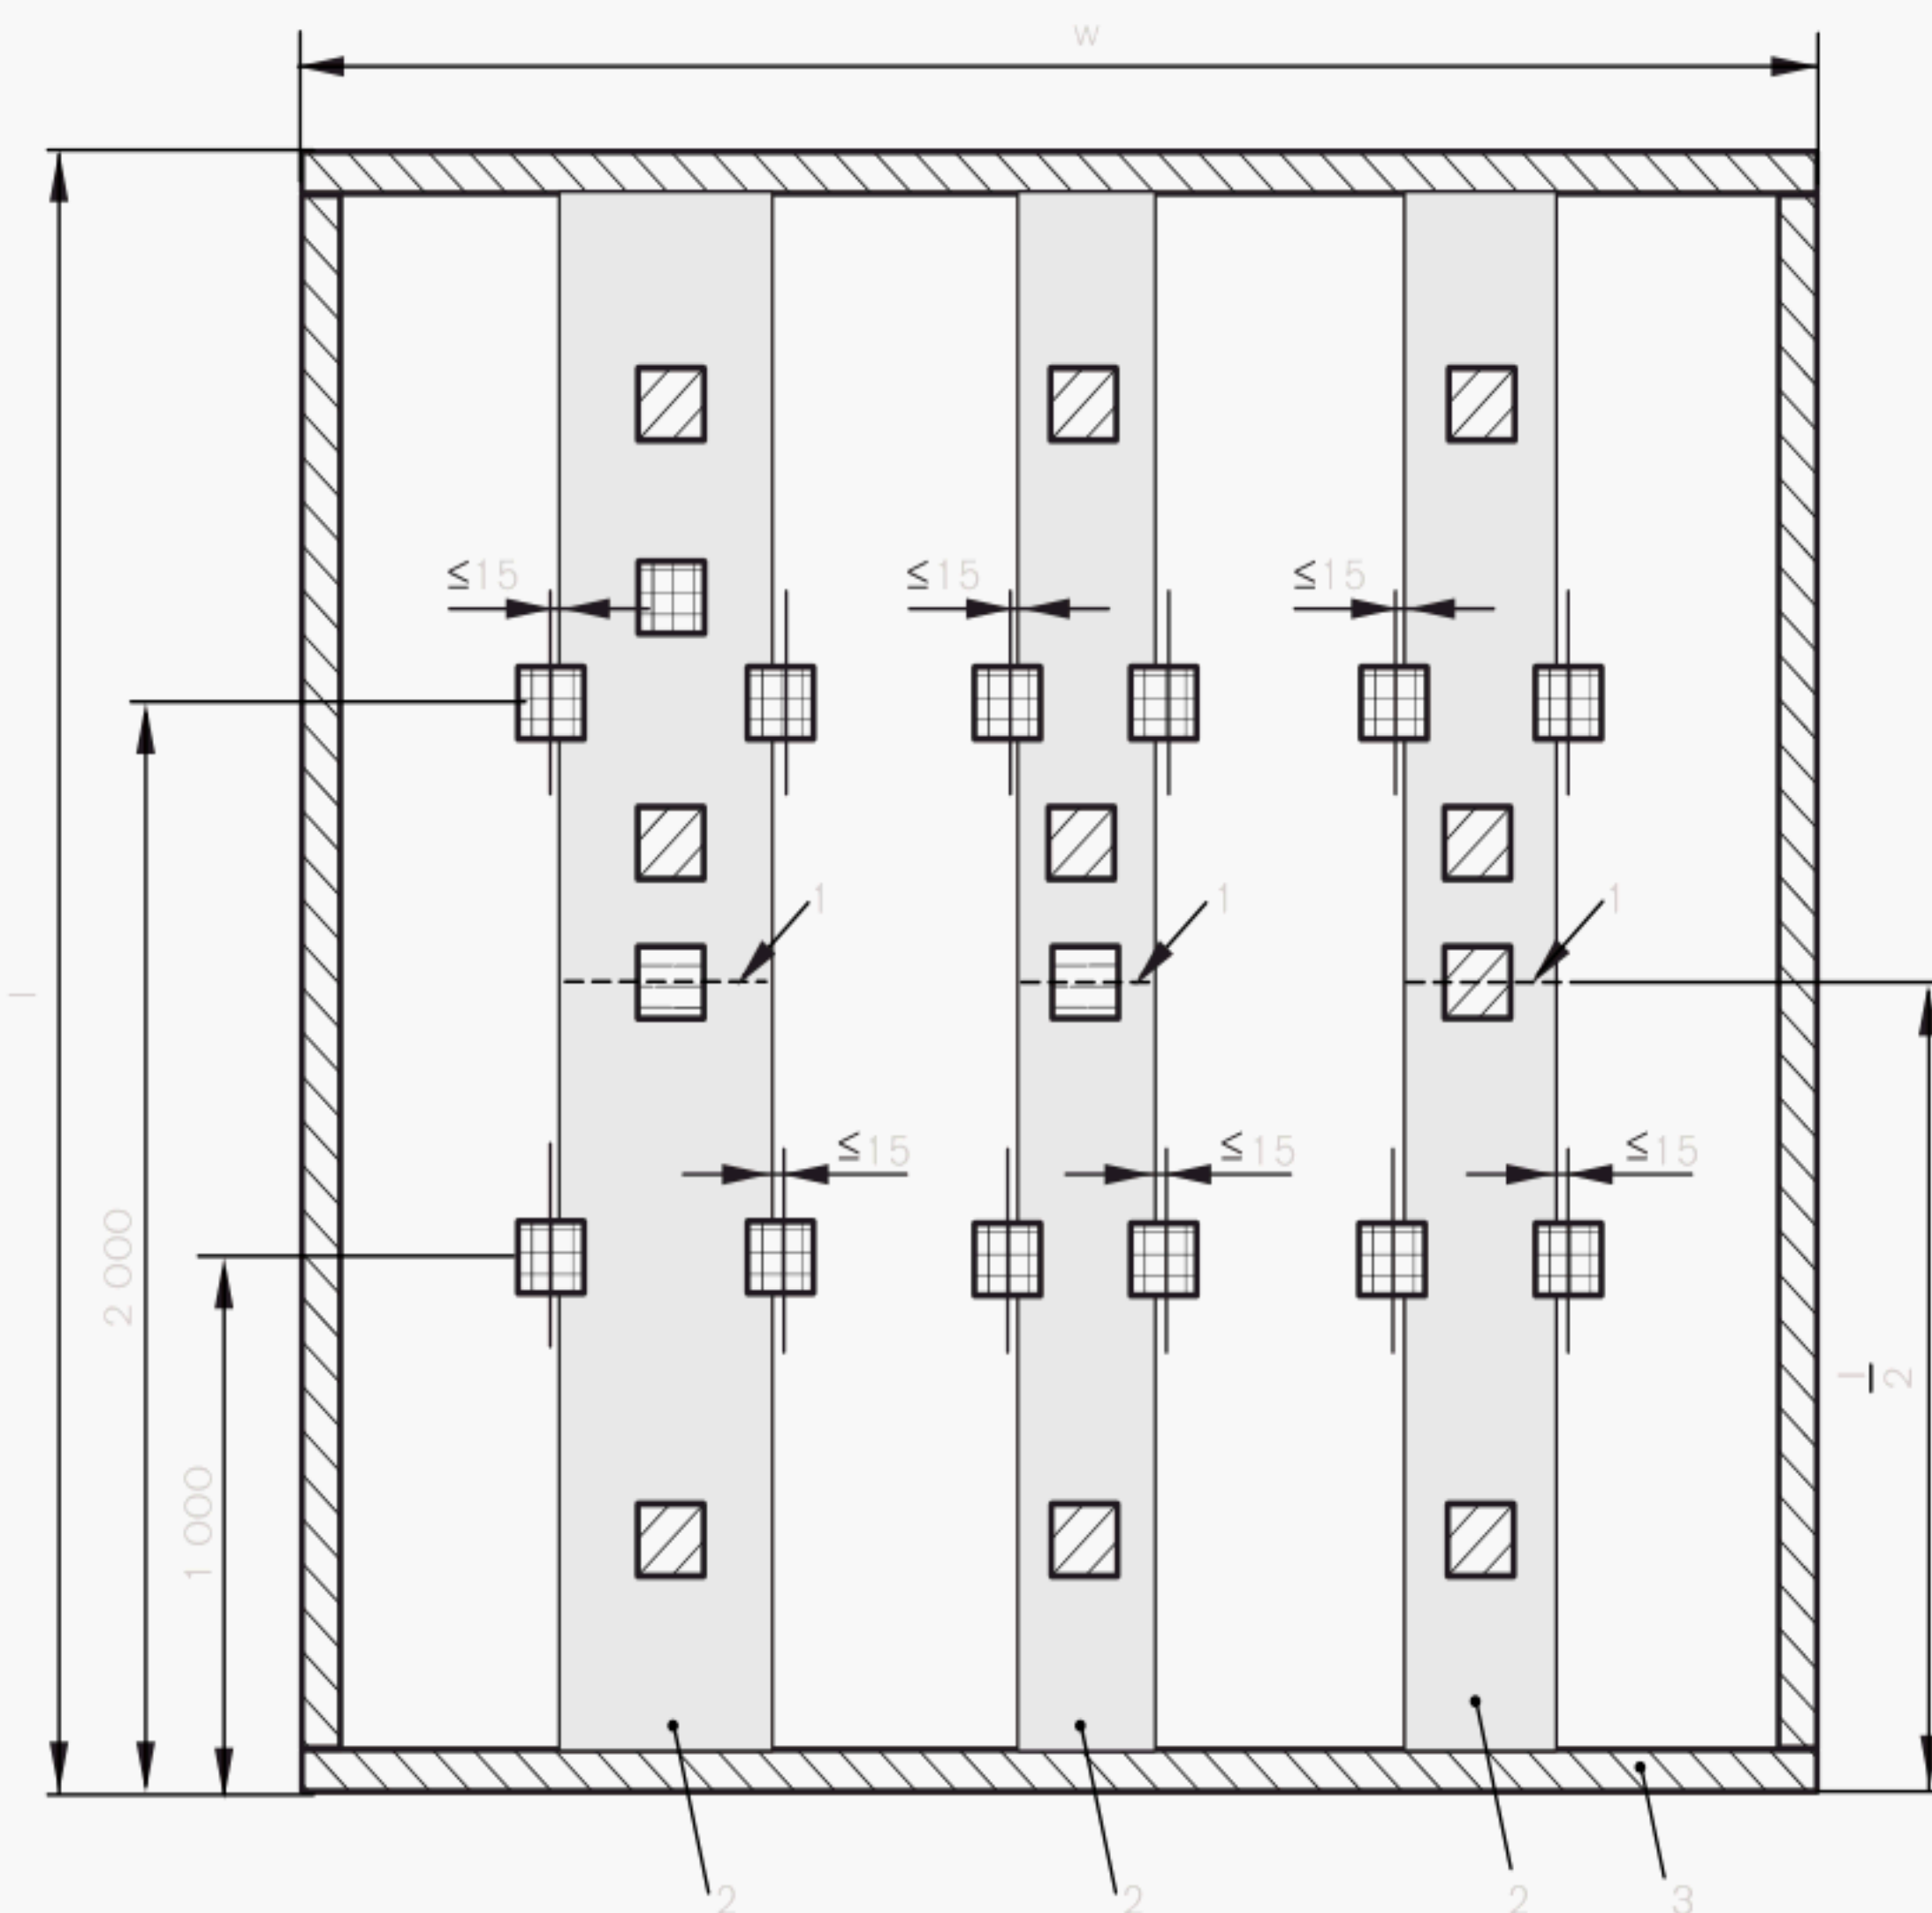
Typical thermocouple layout (full scale vertical furnace, multiple test specimens)
